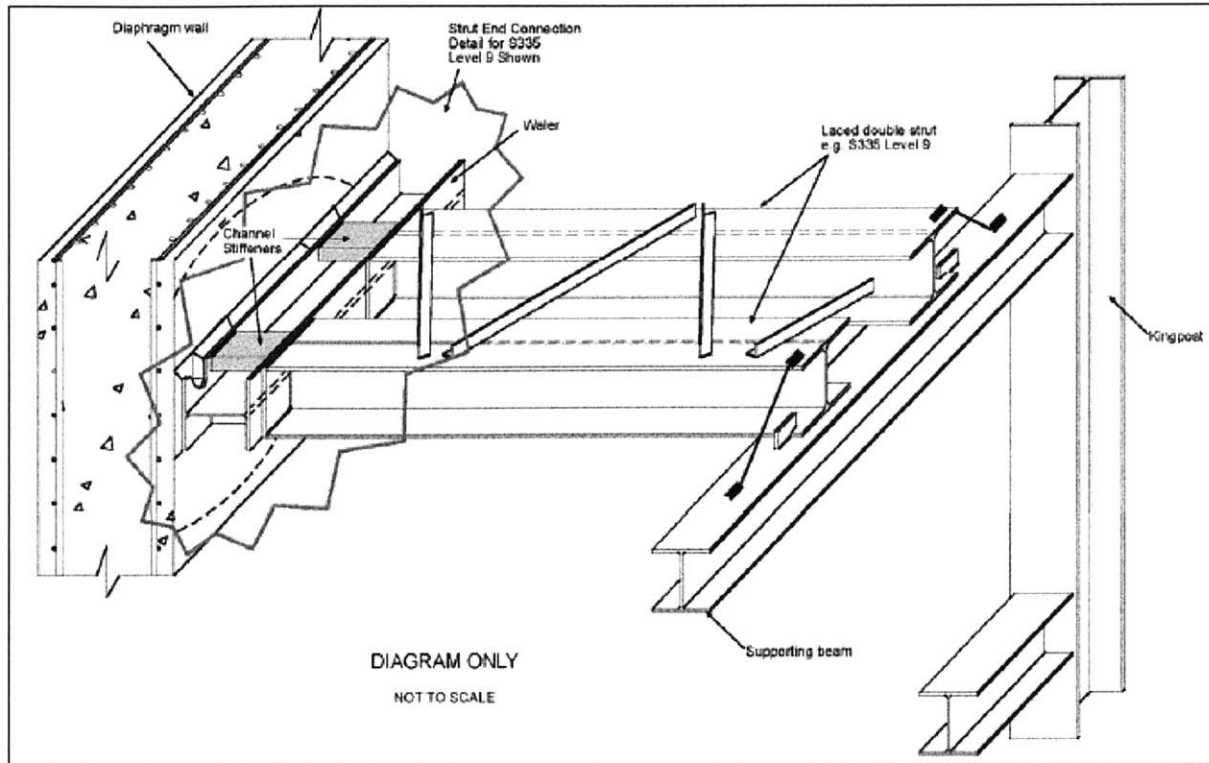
Strut-Waler Connection Channel Stiffeners (MOM, 2005)
